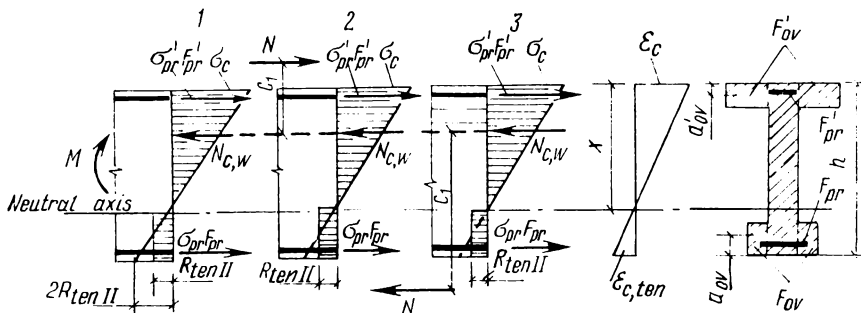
To determining the cracking resistance of prestressed members in (1) bending, (2) eccentric compression and (3) eccentric tension in terms of Stage I with the concrete of the compression zone behaving elastically
